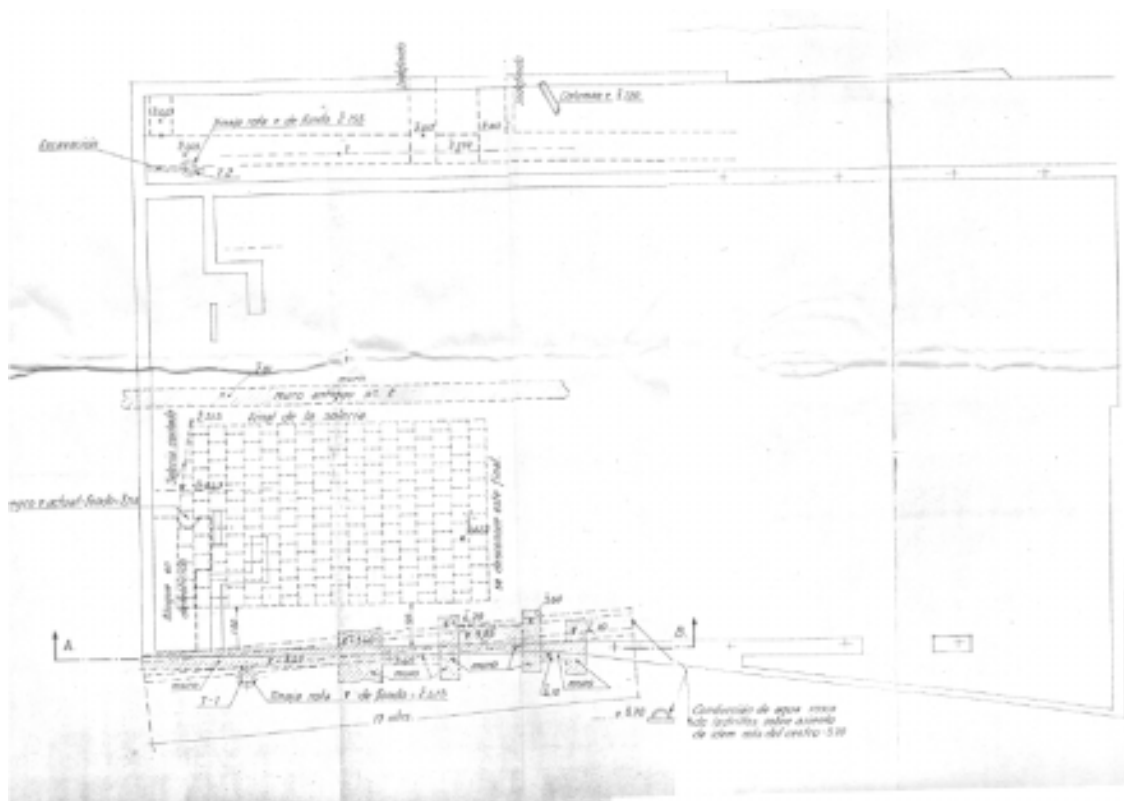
Original site plan of the Cine Imperial site (González Acuña, 2010: 88).
